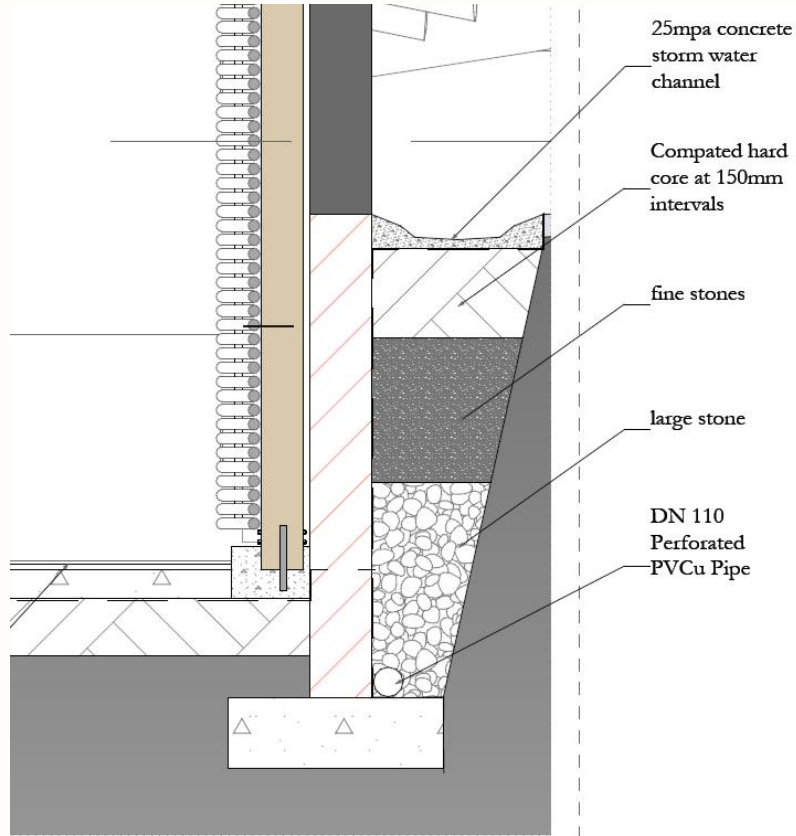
Storm water run off against retaining walls ;detail (Author 2023)
